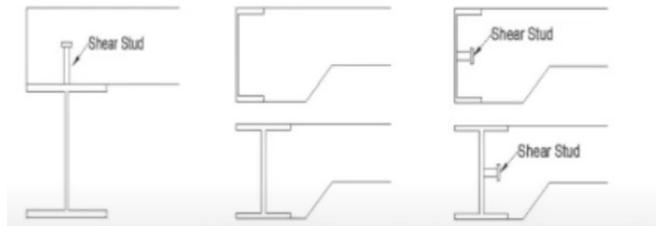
Structural depth of open steel beam and concrete slab (Liew et al, 2009).
